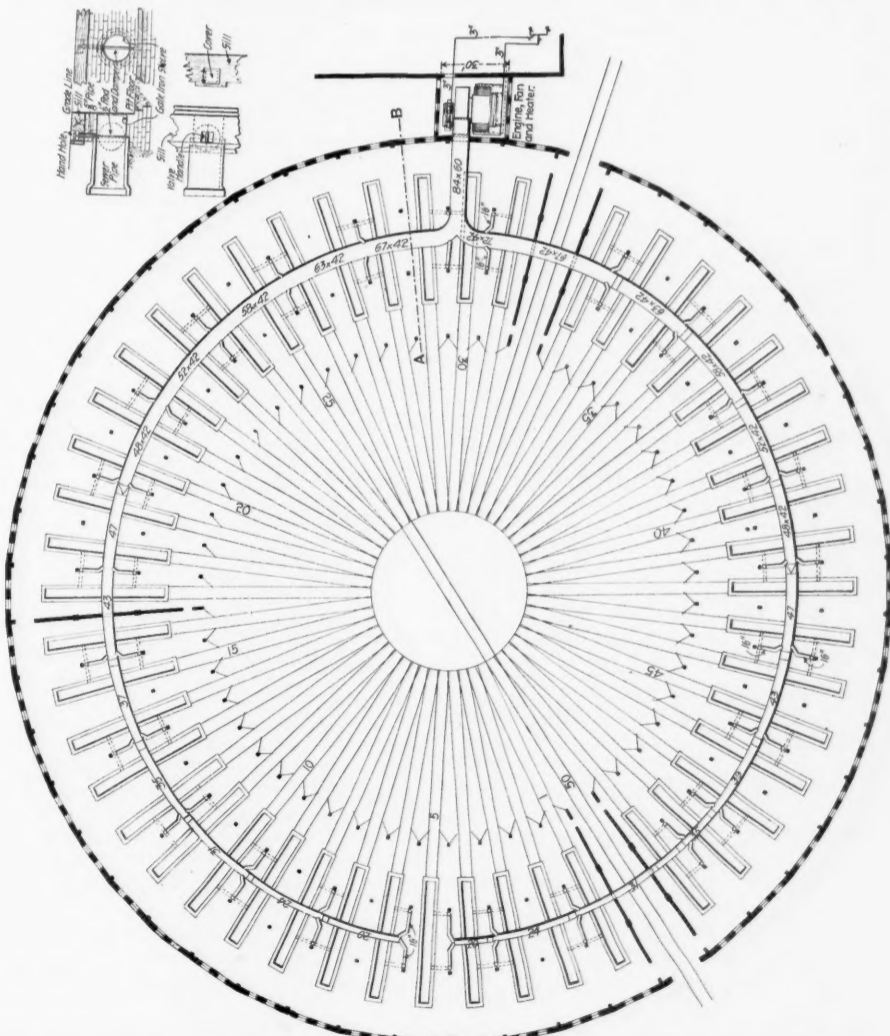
Plan of Heating Clinton Roundhouse—Chicago & Northwestern Railroad.
